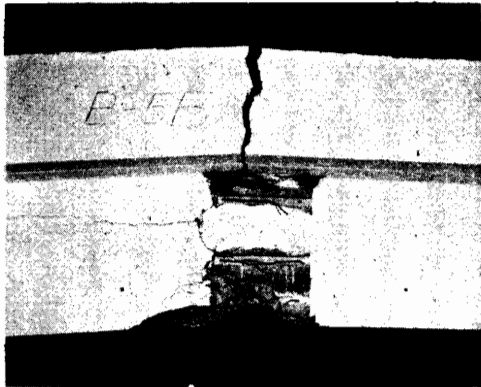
THIN-FLANGED TEE BEAM SPECIMENS
